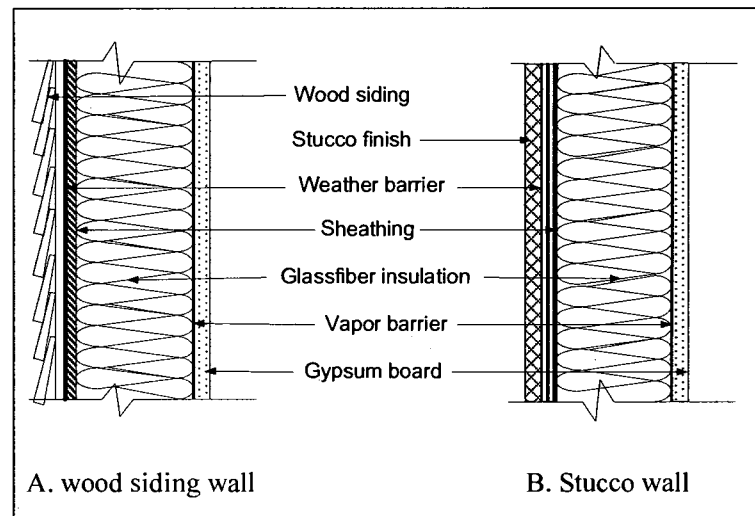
Section view of wood-frame wall panels (Fazio et al. 2006a)
